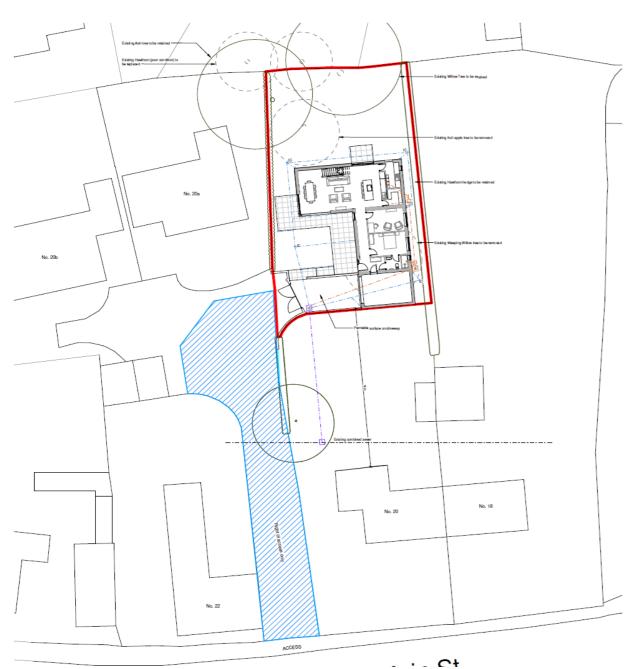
Proposed Block Plan with indicative drainage (NTS)
